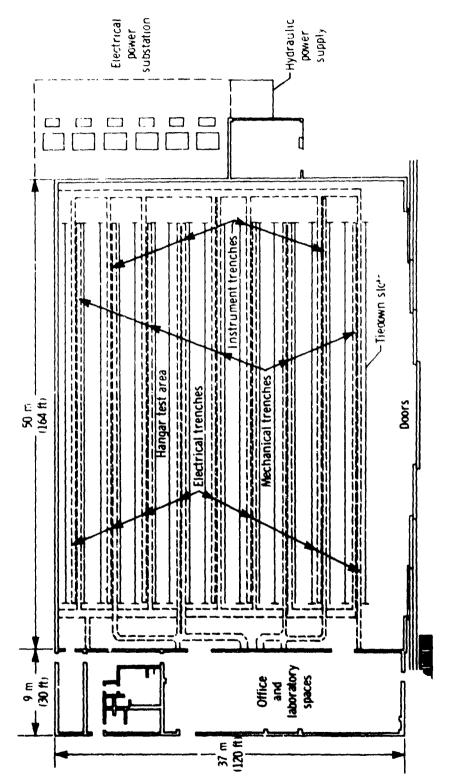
Building layout of NASA Dryden Flight Loads Research Facility.
